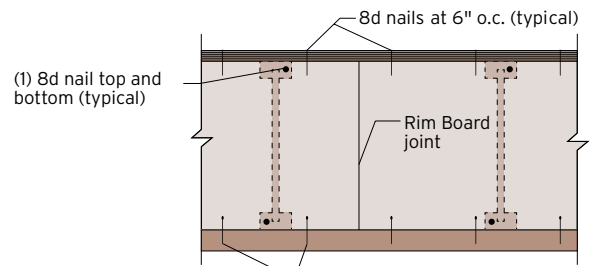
ATTACHMENT DETAILS WHERE RIM BOARDS ABUT
